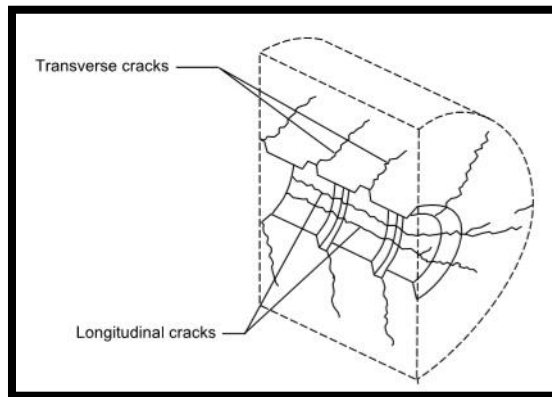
Longitudinal and transverse cracks caused by bond stresses (Tahershamsi, 2016)
